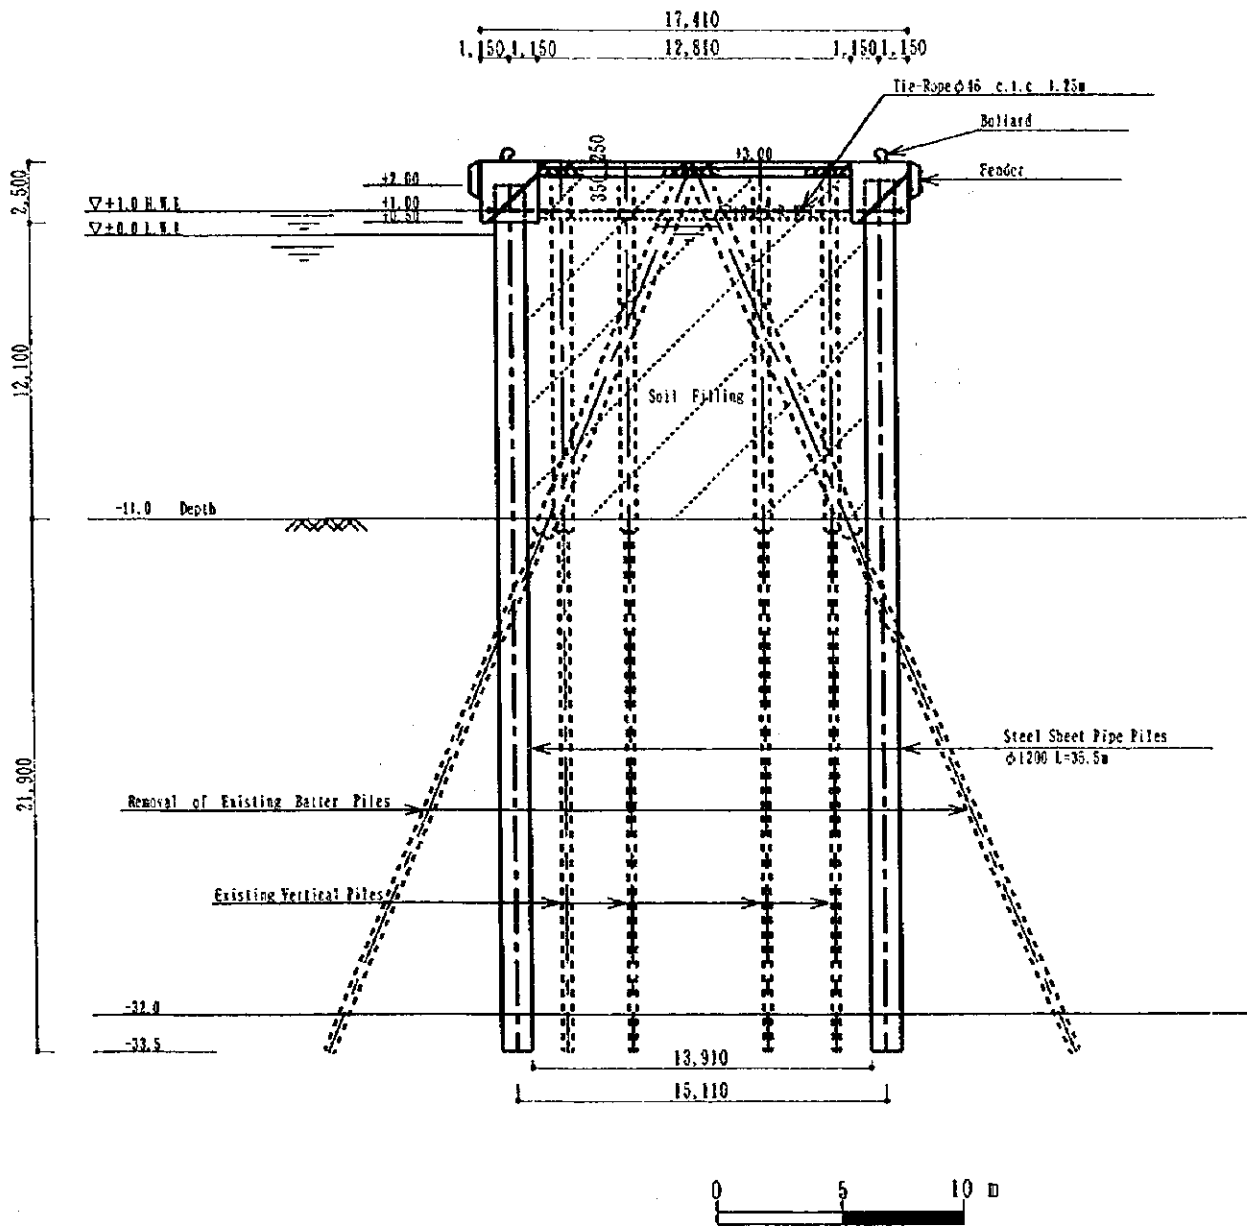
Cross Section of Reconstruction of Existing Wharf (Alternative Plan 2)
